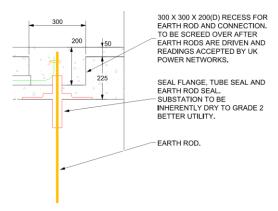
Proposed Typical Earth Road Installation within the floor slab at basement level
